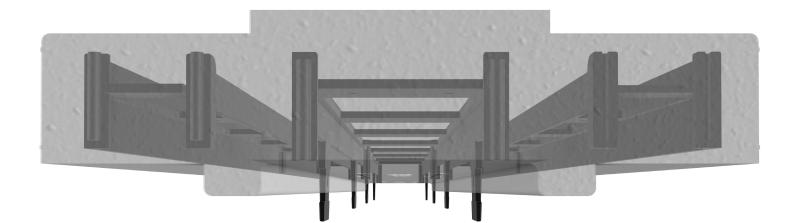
BuildBuck assembly showing embedded webs with "T" concrete anchors and foam insulation.
